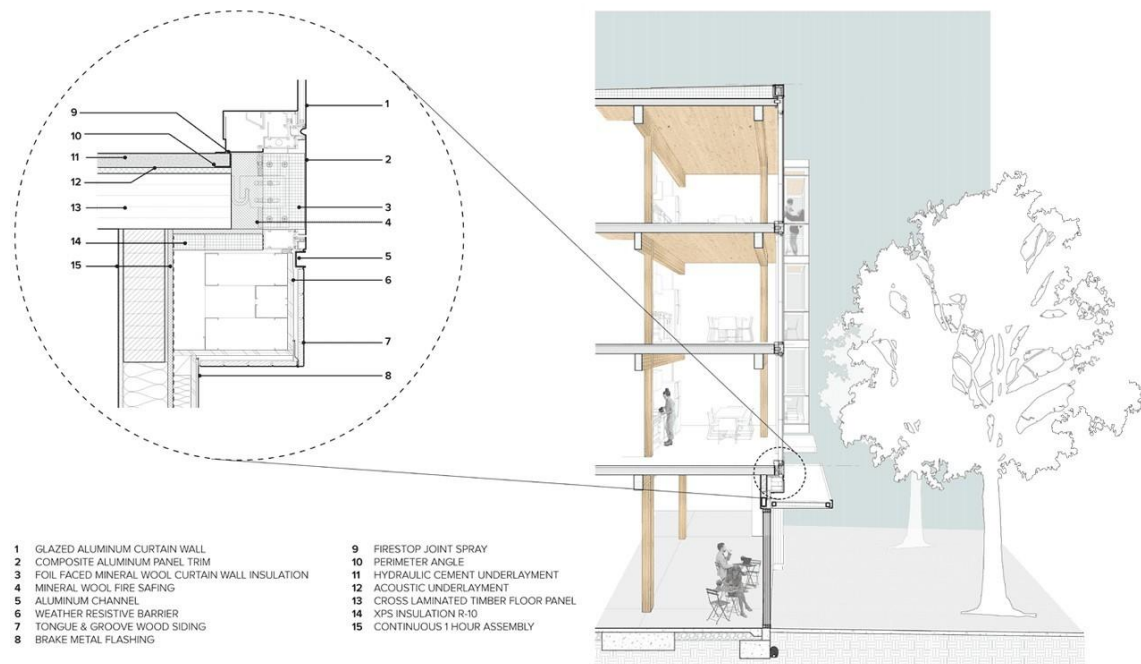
Graphical documentation of the CLT modular system, including plans, sections and construction details enabling industrial fabrication and precise on-site assembly.
